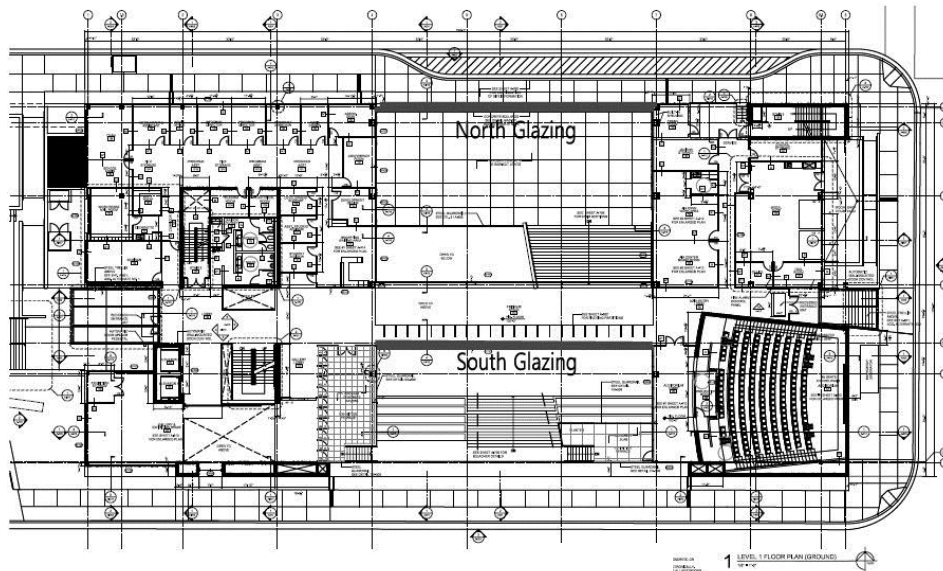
North Glazing Design South Glazing Design on First Level Floor Plan. Modified by Nicole Trujillo. (Courtesy: Jon Anderson Architects)
